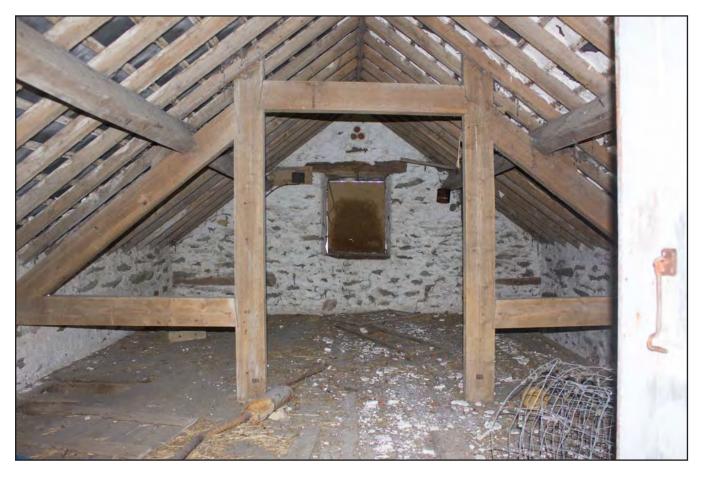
Hayloft, First floor, within Building 2 - Horse/Pony Stable at Gaer Gerrig, Llangwm, Conwy - from the northwest - no scale
